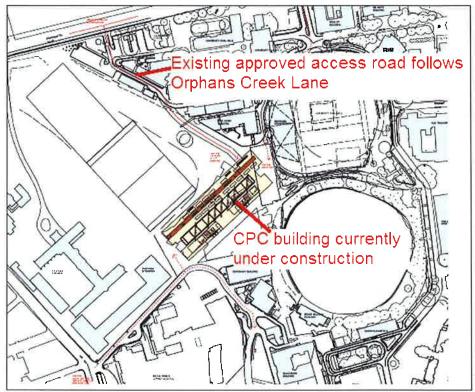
Current approved vehicular access to the site via Orphan Creeks Road
